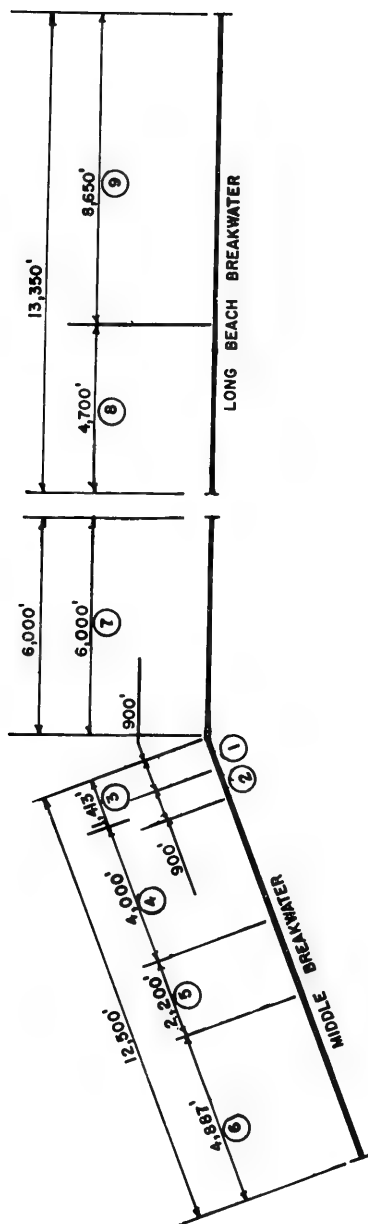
General plan of breakwaters. Circle numbers indicate breakwater sections covered by various construction contracts mentioned in report.
